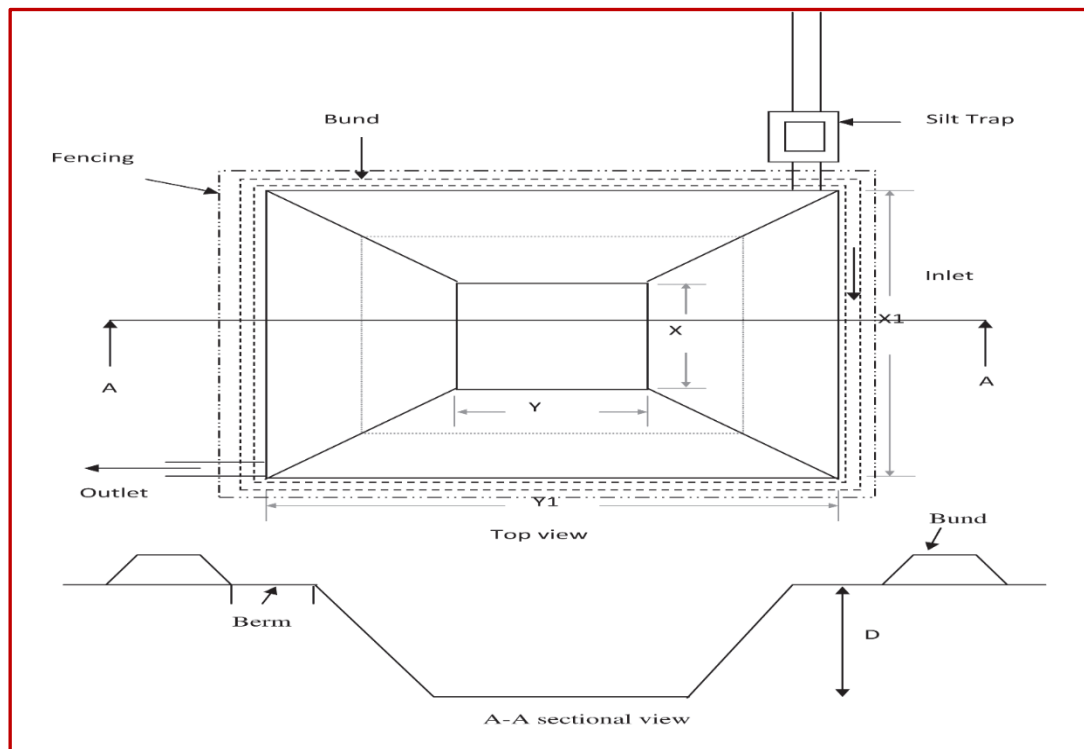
Lay out of diagram of farm pond. [Source: Reddy et.al]
